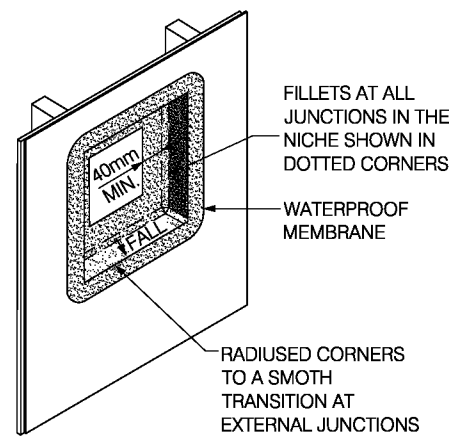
NICHE IN SHOWER WALL FRAMEWORK
